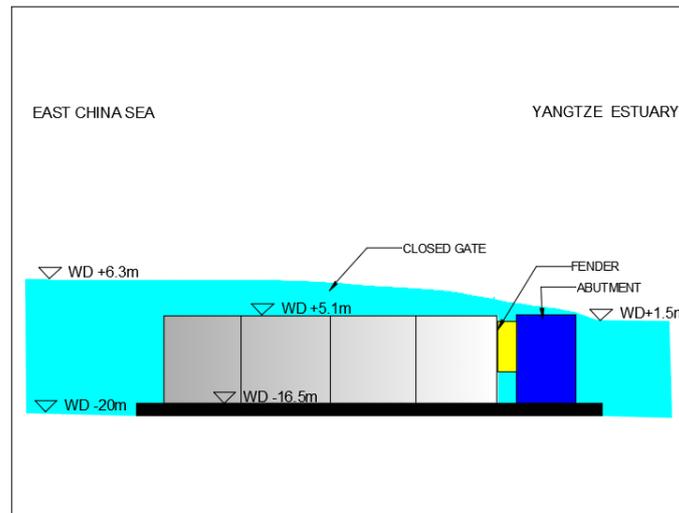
8. Closed gate during storm conditions, not to scale (cross section 3-3')
